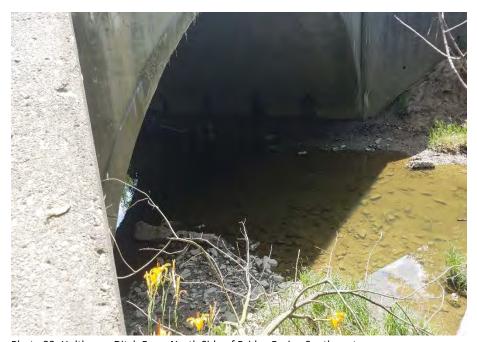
Holthouse Ditch From North Side of Bridge Facing Southwest
